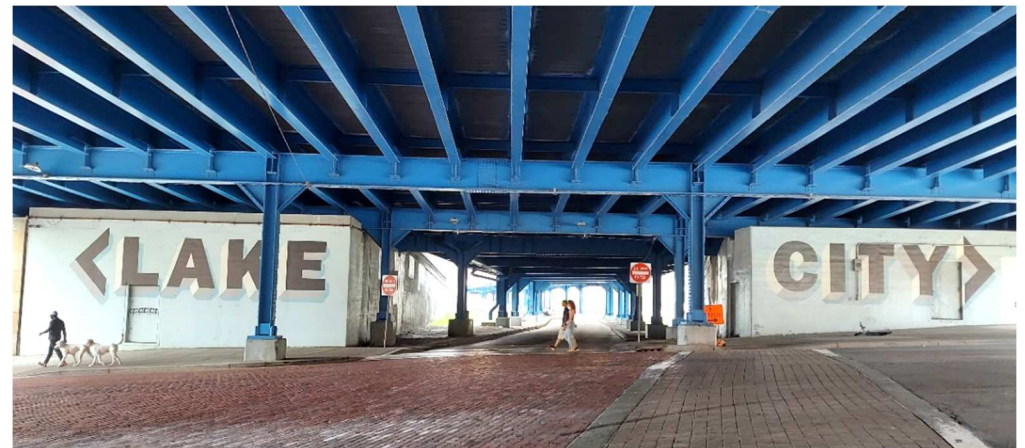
Views from under the Main Avenue Bridge at West 9<sup>th</sup> Street, uphill from the Flats East Bank
